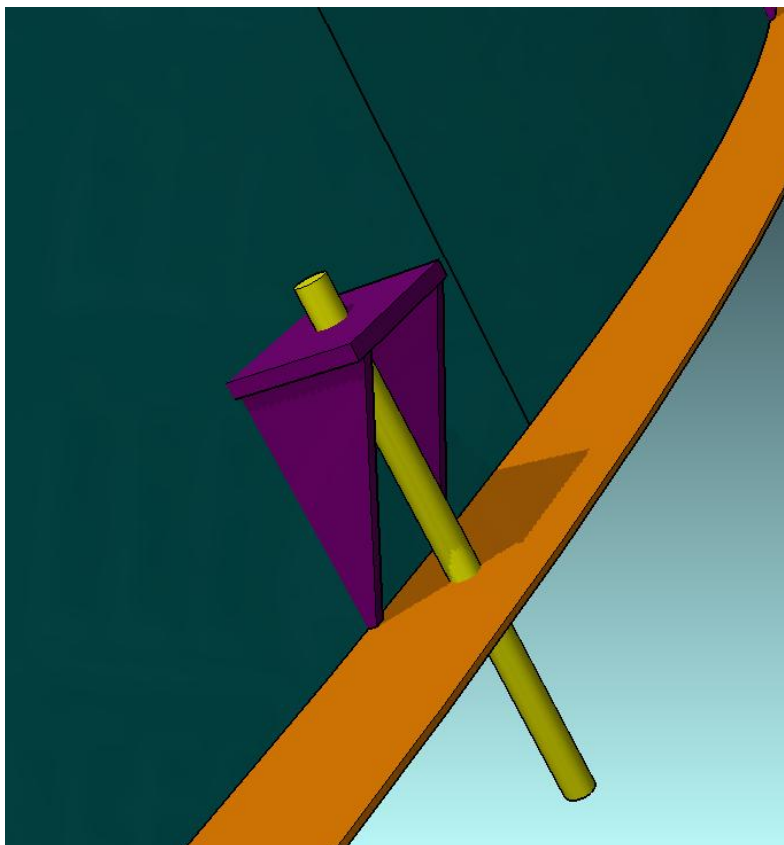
Detail of the 3d design of anchor chairs with anchor bolt in tank
